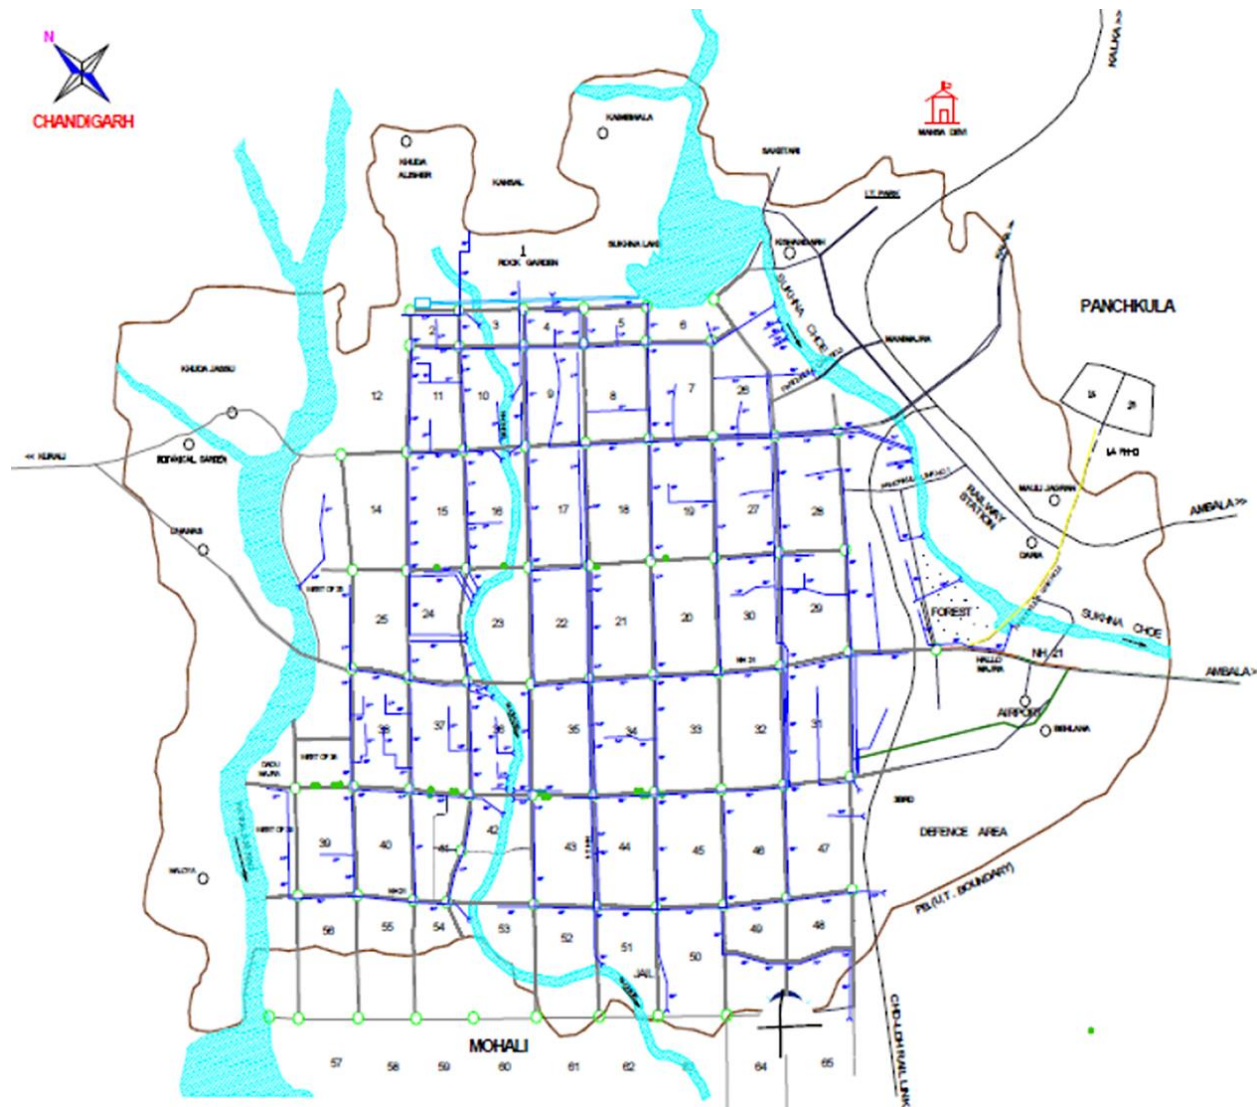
Storm drainage map of Chandigarh showing outlets on site.
